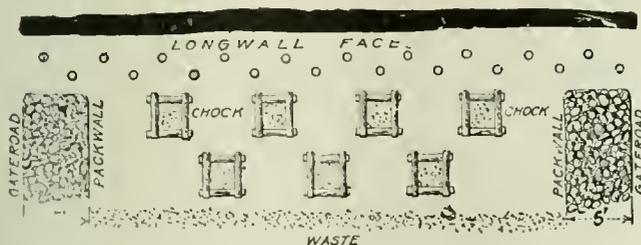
TIMBERS AND COGS ON A LONGWALL FACE
